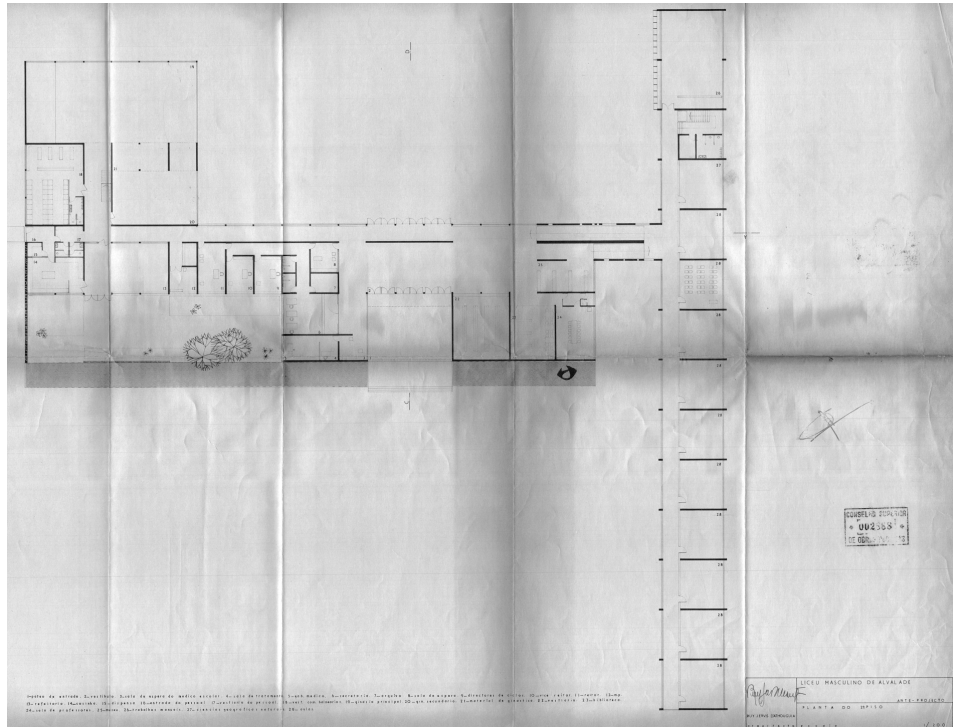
Ground floor plan of the design for Liceu Padre António Vieira.
